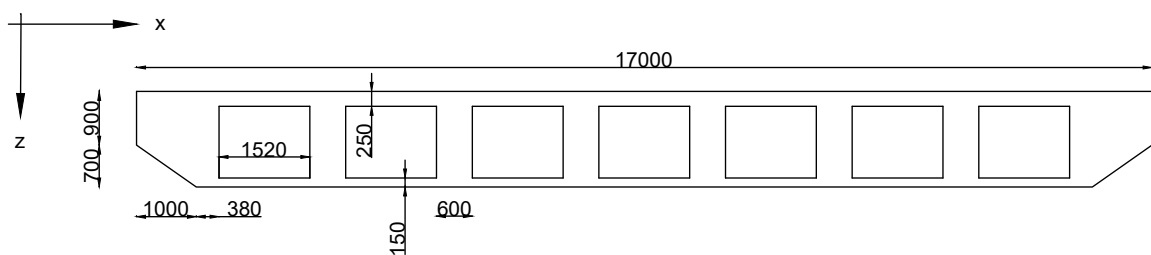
Cross-section bridge decks intersection Rozenburg
